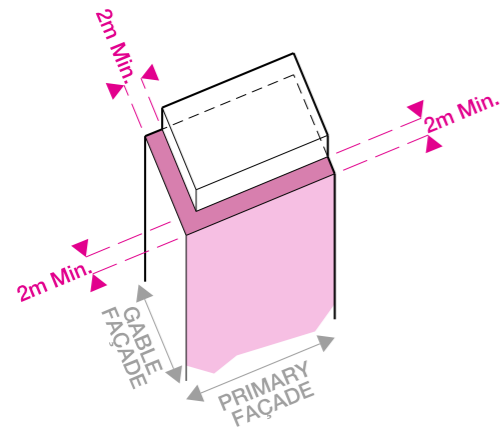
Configuration of setback floor - 2 sided set-back top floor.
